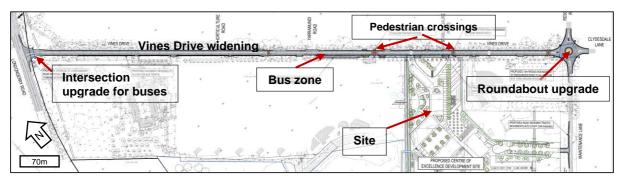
| Proposed road widening and upgrades (Source: Applicant's RtS 2021)
